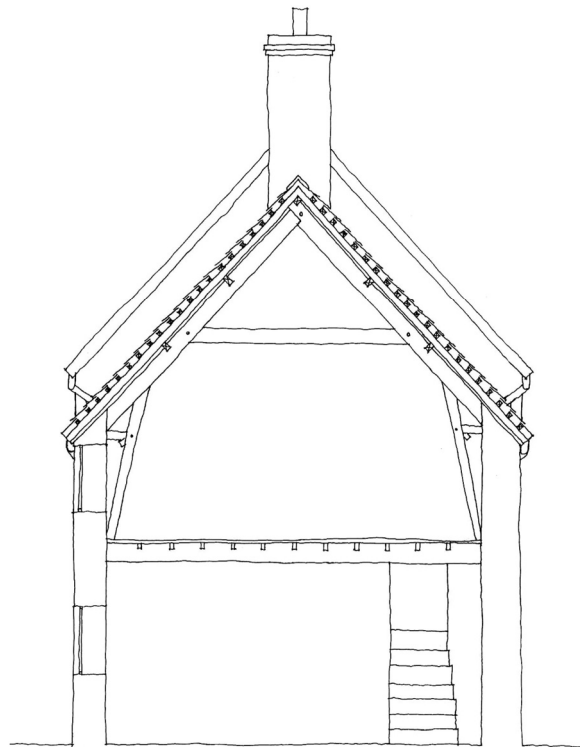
Construction section through Parc Lodge Farm 1:100
